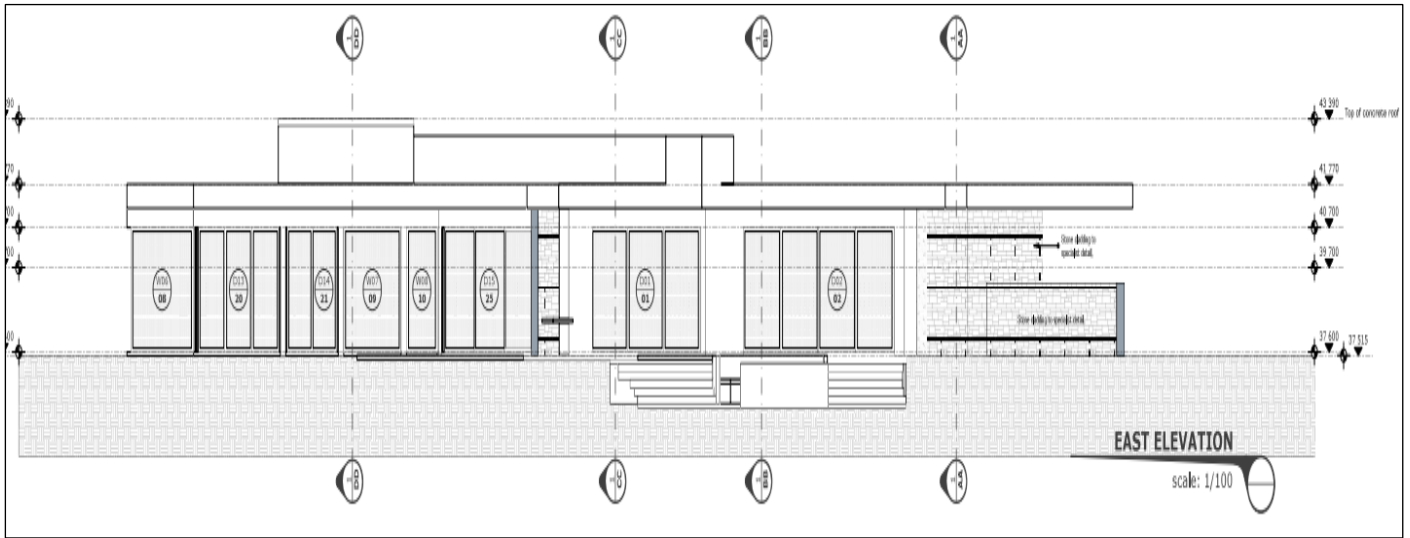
East elevation of the proposed entertainment facility (TMBA, 2018)
